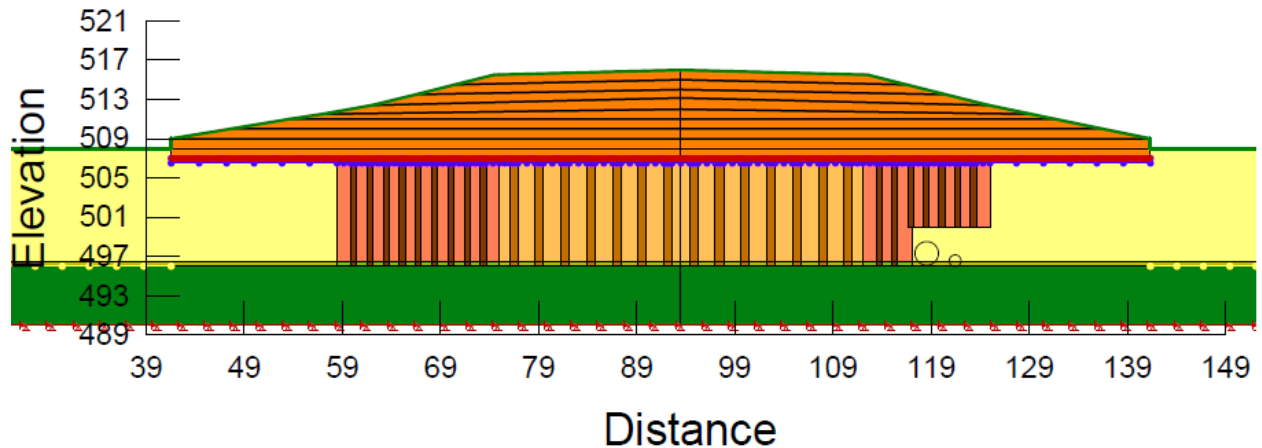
FEM North Abutment Cross-Section Model Completed Stage with Drainage Influenced Soil Zones
